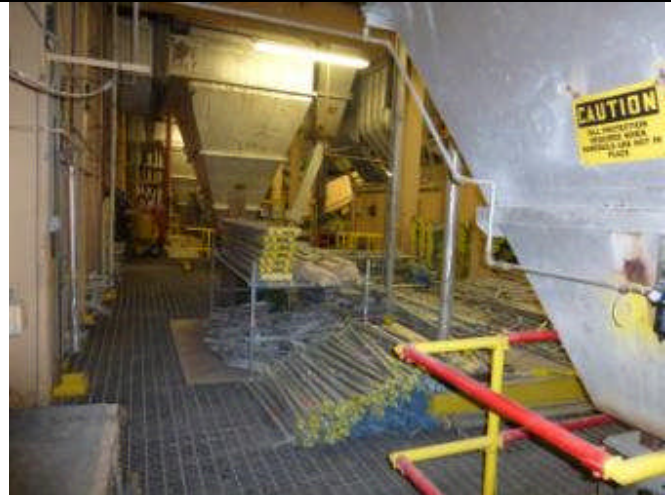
Scaffolding and outage materials at Barn Door Elevation
